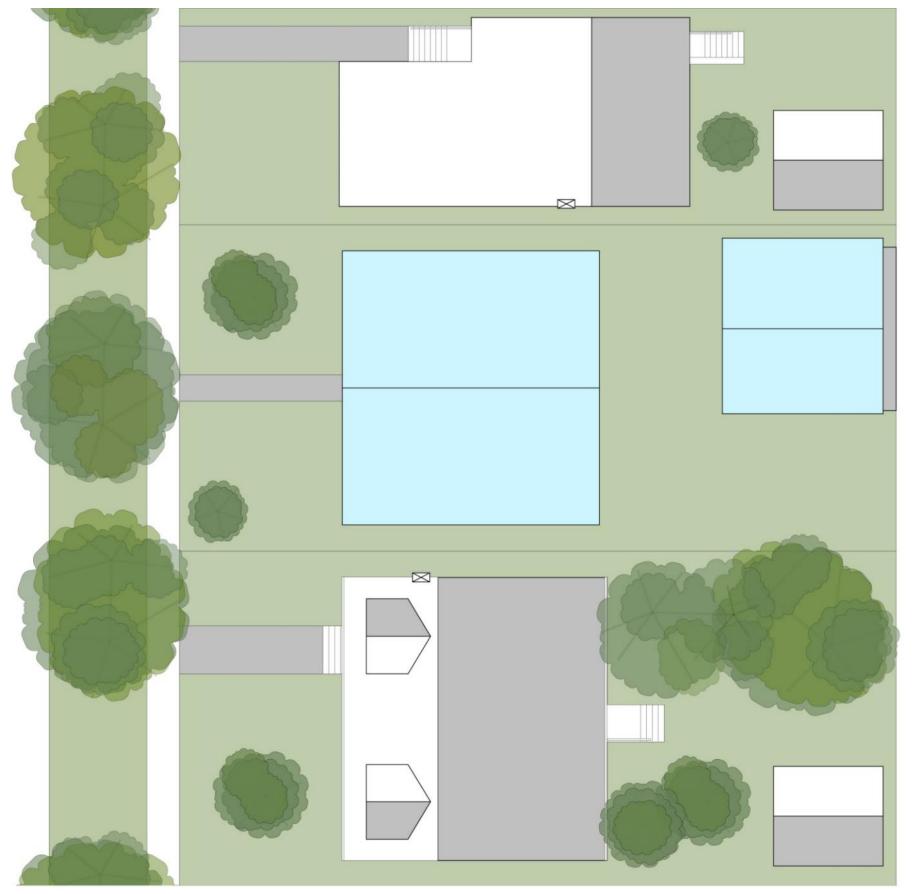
4 foot side yard setbacks on a 50 foot wide lot by 110 feet deep.
